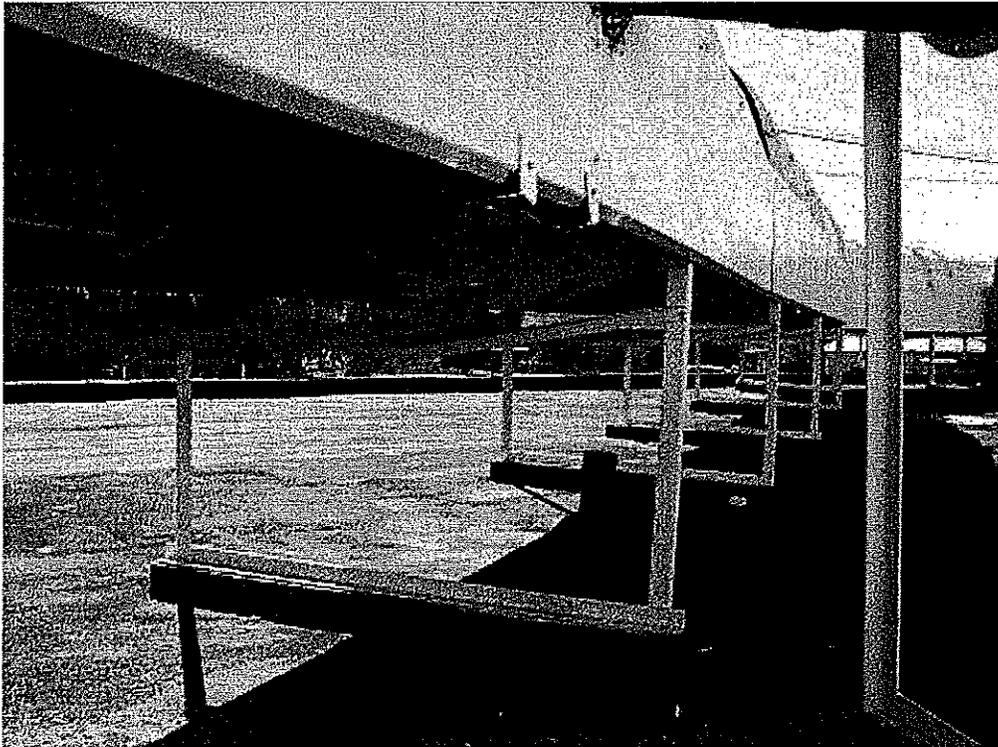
(Photo 3) : Underside of the ductwork in photo 2.
